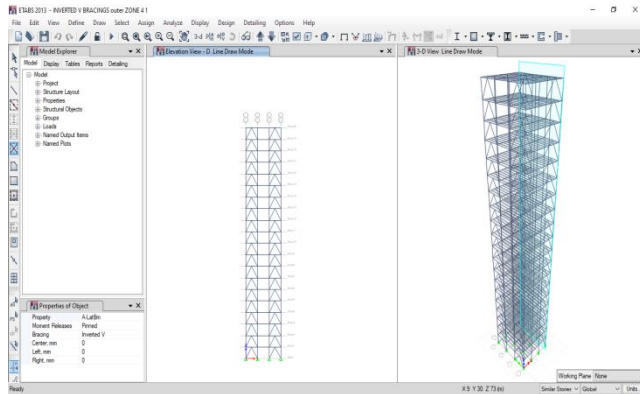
Elevation and 3D view of the building with inverted V bracings at outer bays
